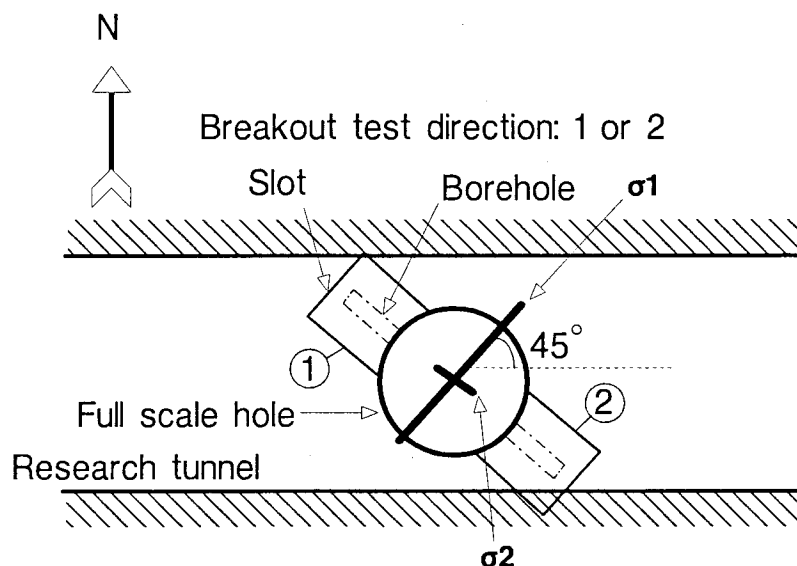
Horizontal section of the Research Tunnel showing the direction of primary in-situ stresses and preliminary lay-out of the test.
